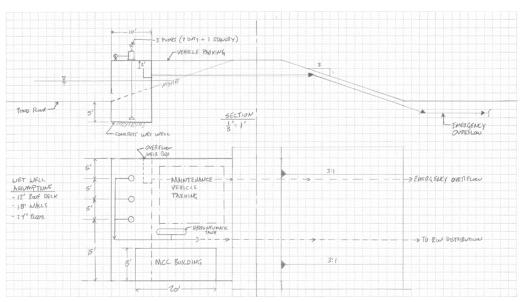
Typical Pump Wet Well Cross Section and Plan View for Storage Ponds
